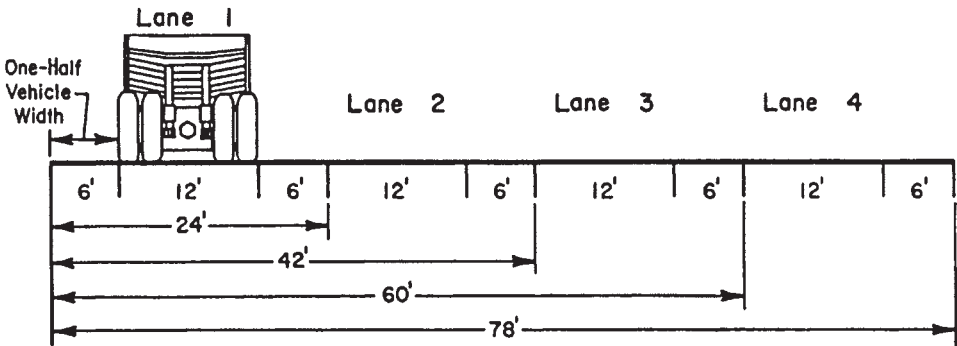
Multi-lane road design widths (Kaufman & Ault, 1977).
